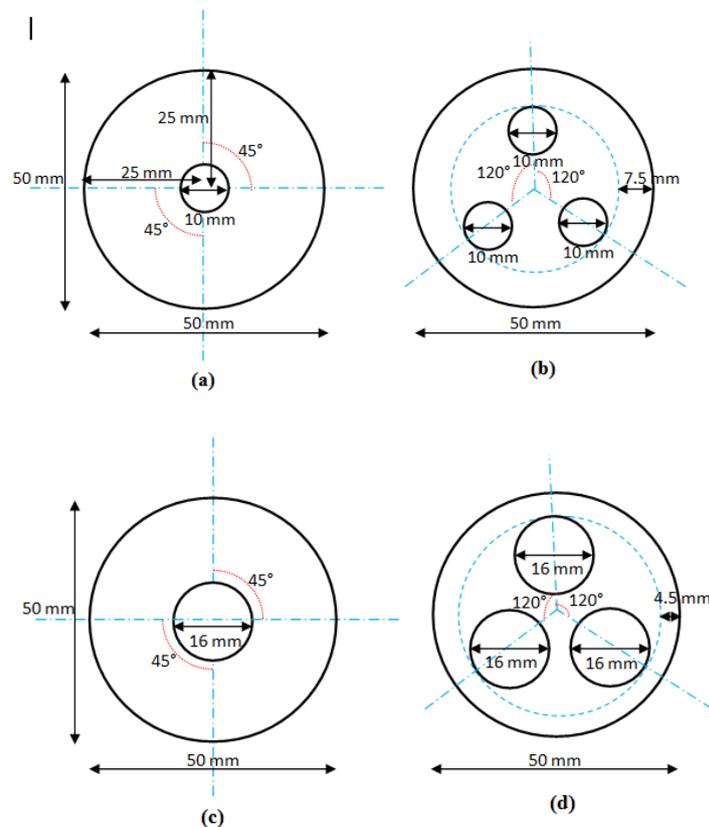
Detail column arrangement for single and group bottom ash columns installed in clay specimens
